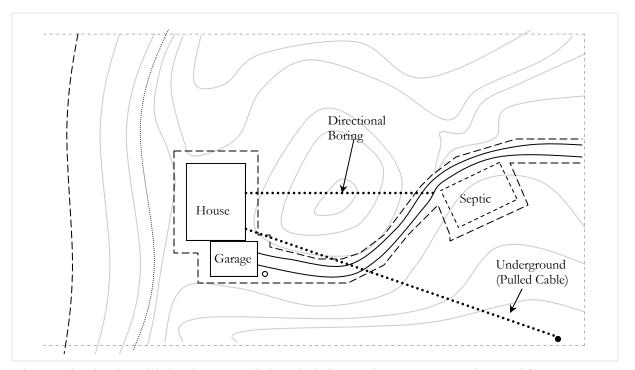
Site plan that minimizes impacts to all slopes including moving structures to reduce need for excavation (and facilitating ability to balance volumes on site), reduces total area of impact, utilizes directional boring to connect septic, pulling cable instead of trenching, and moves well to location within reduced impact area to eliminate future disturbance to slopes.
